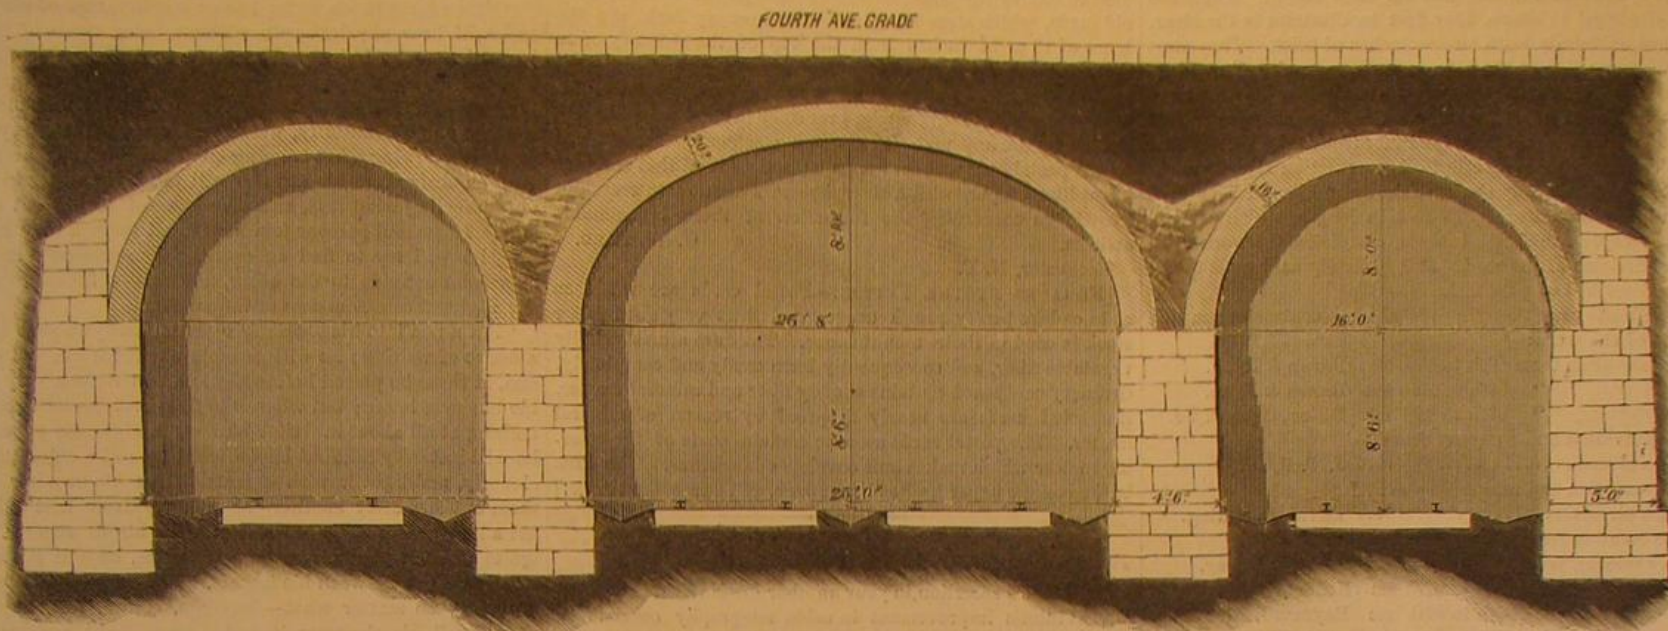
THE UNDERGROUND RAILWAY IN NEW YORK.—CROSS SECTIONS OF THE MASONRY TUNNELS.
